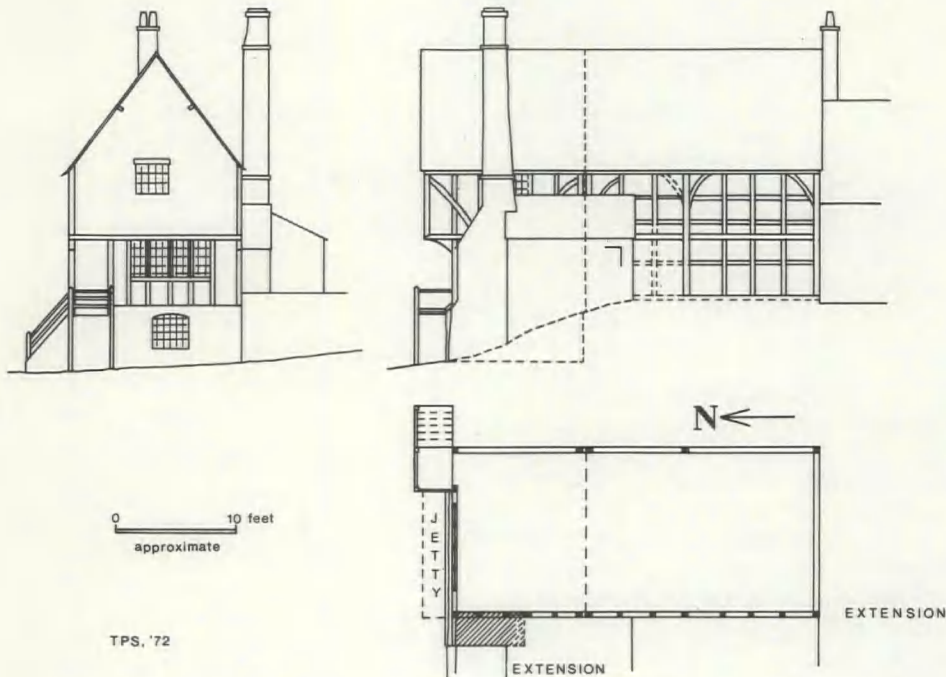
Conjectural plan of timber-framed building in demolished Upper George Street, Luton.
